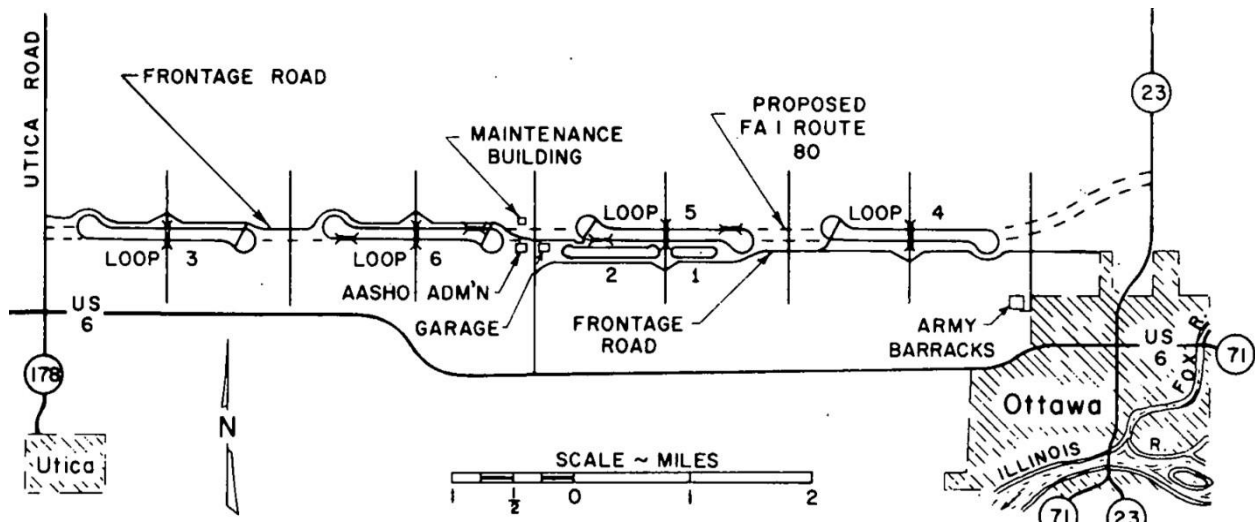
Layout of AASHO Road Test (AASHO, 1962)
